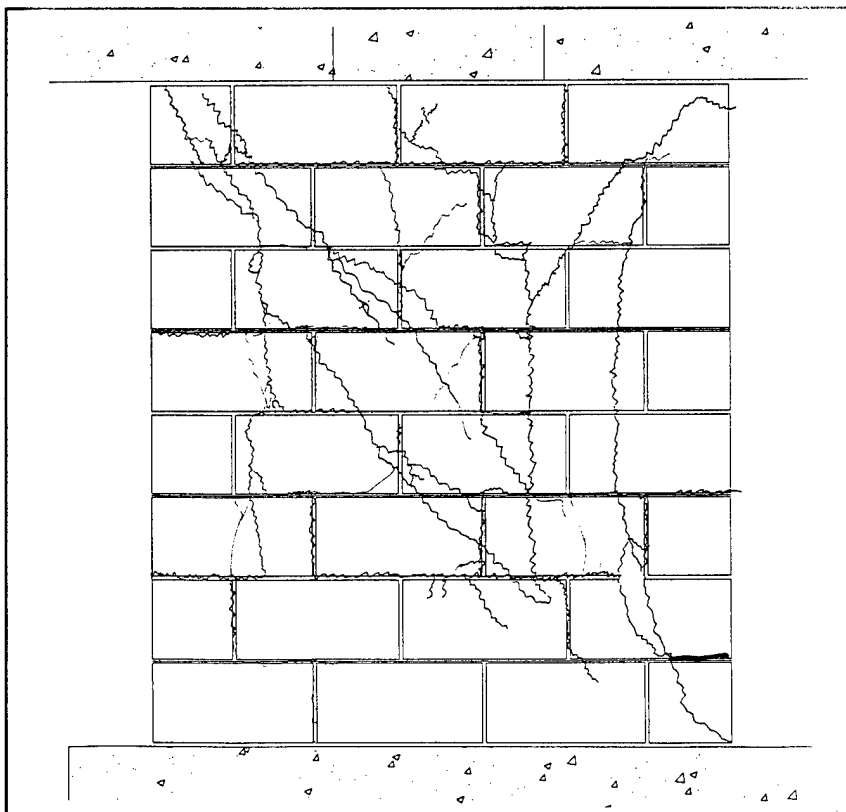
Final crack pattern representing complete failure of lightweight CMU test wall.
